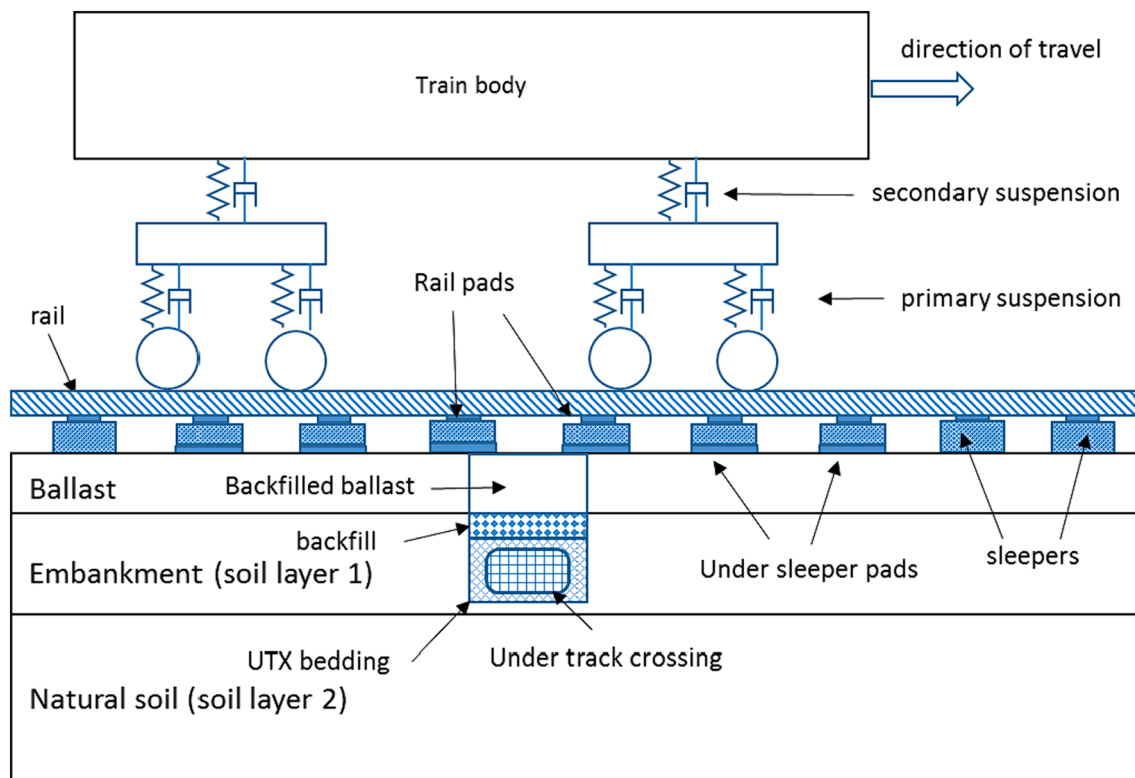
Schematic of 2D elastic finite element model of flexible under-track crossing (UTX) installation at Oddingley [58].
